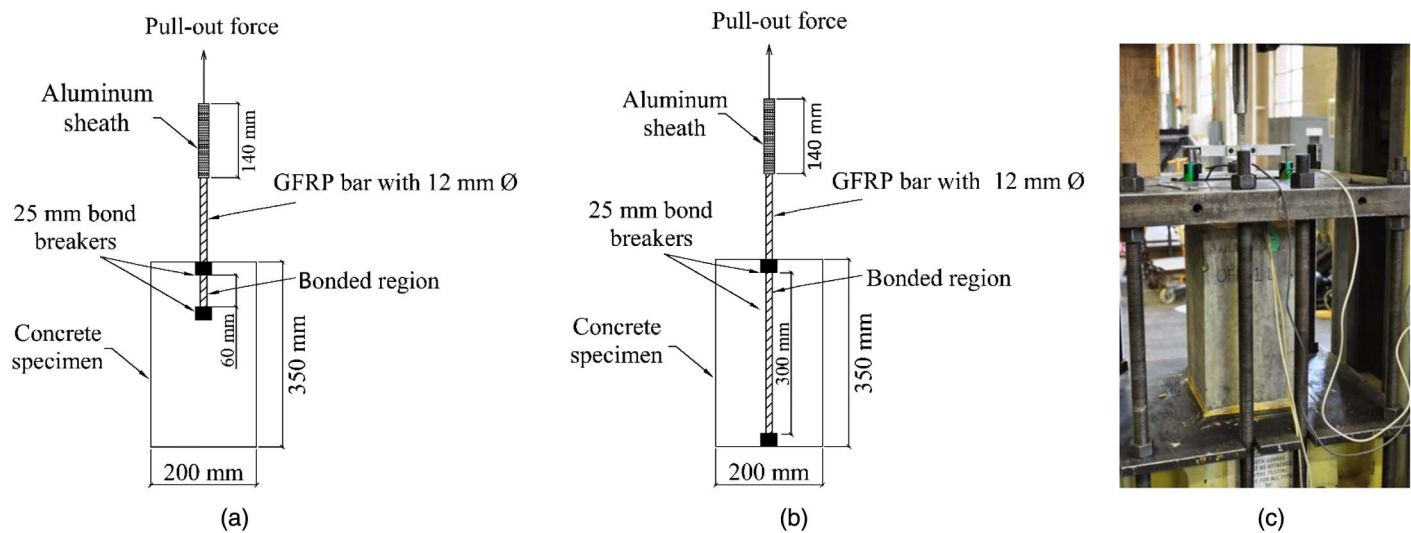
Details of pullout test: (a) test specimen with a shorter embedment length (60 mm); (b) test specimen with a longer embedment length (300 mm); and (c) pullout test setup.
